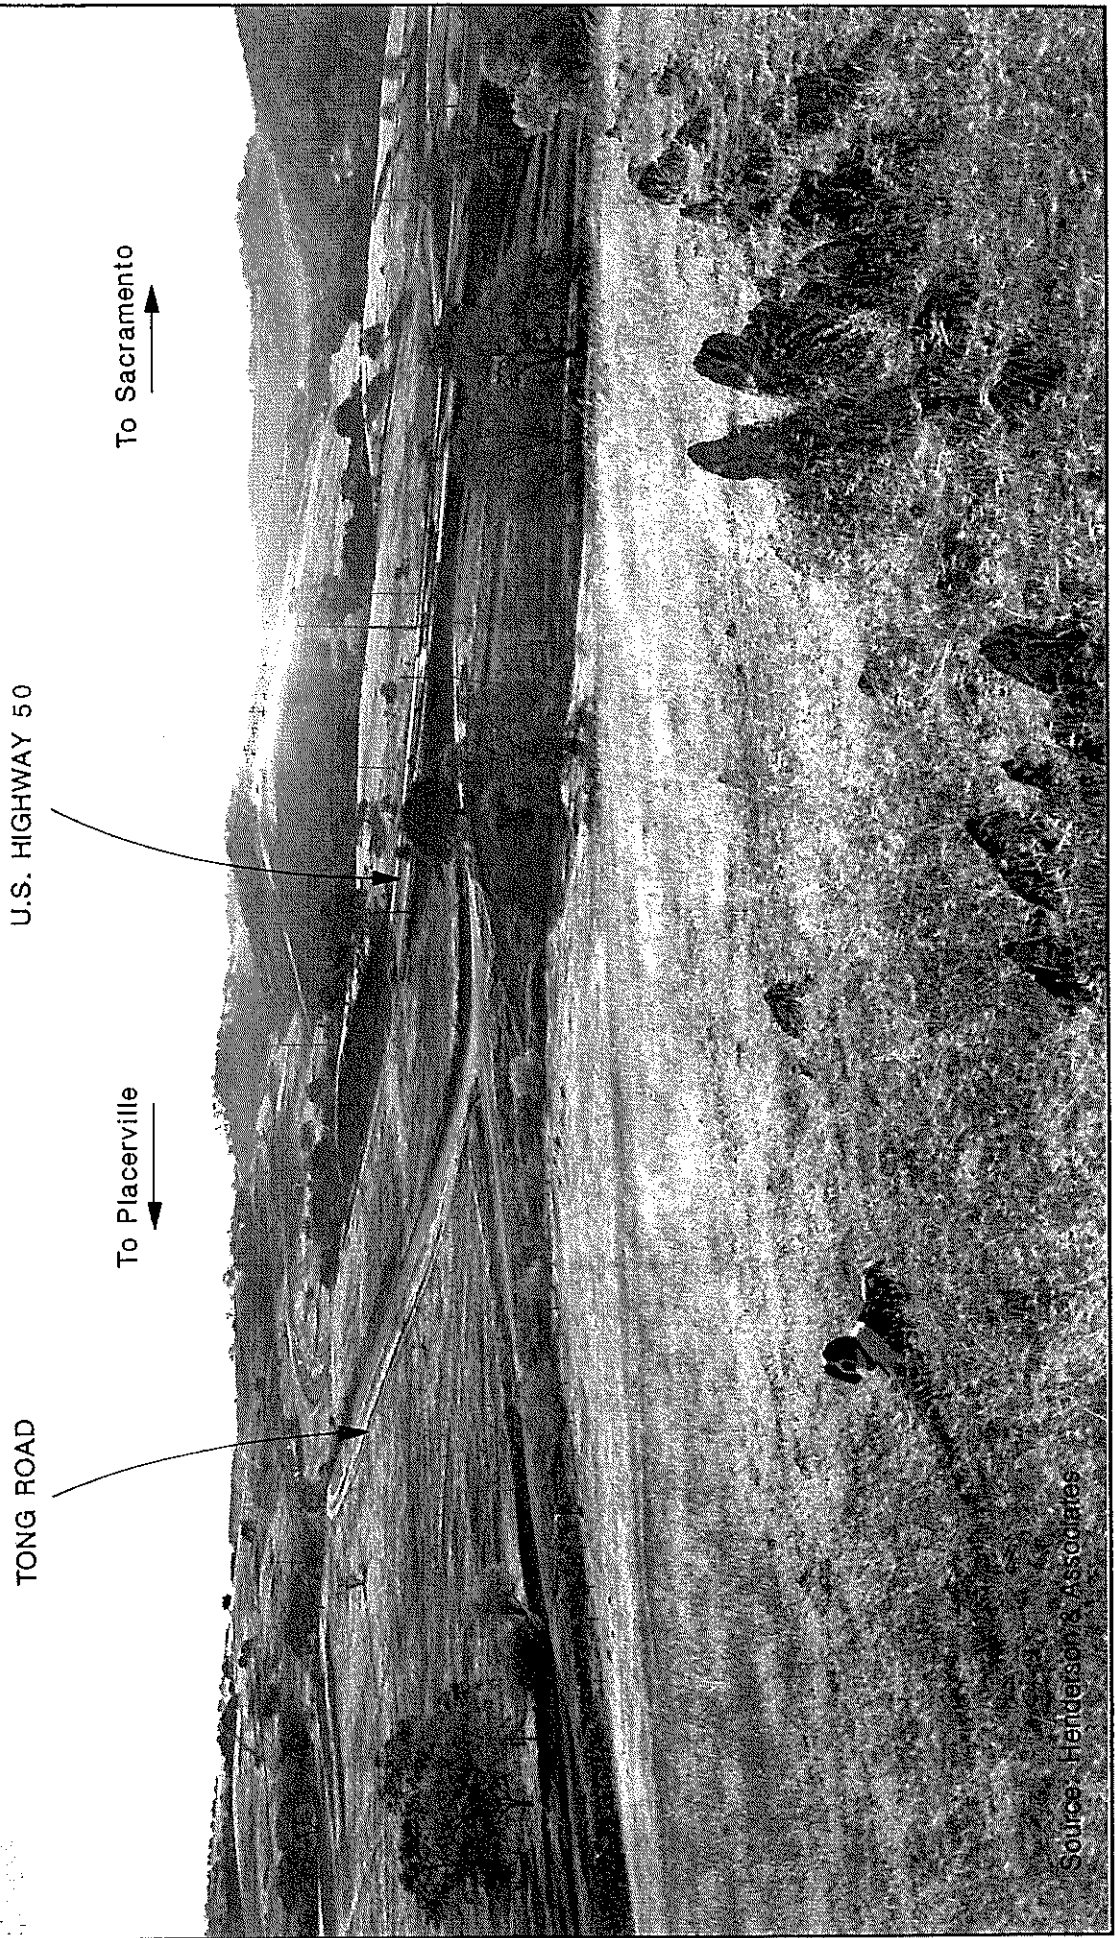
VIEW OF UNDERCROSSING DESIGN FROM PHOTO LOCATION #1
